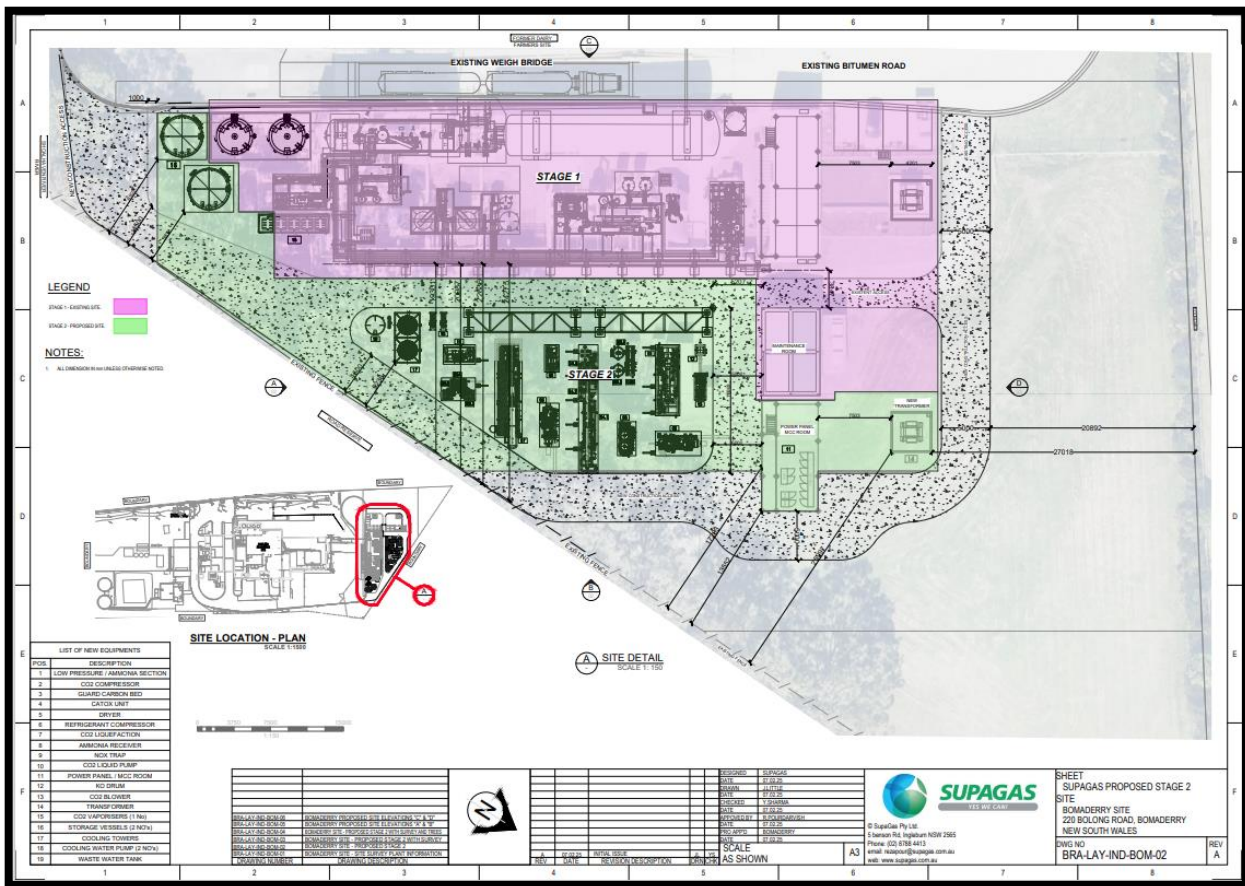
Proposed Modified CO₂ Plant Stage 2 Layout
